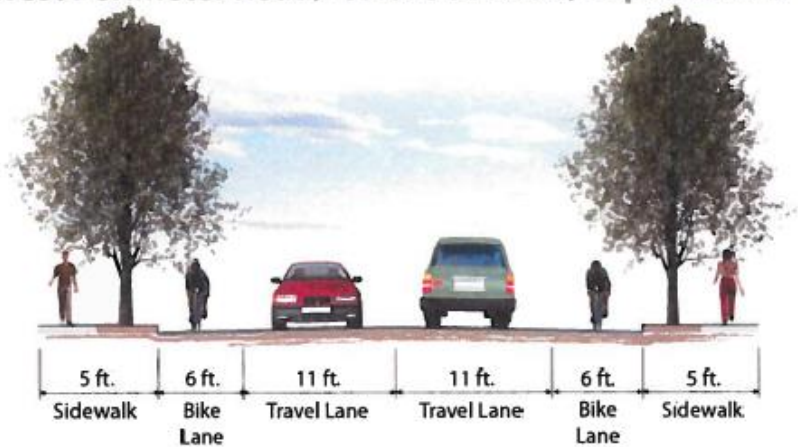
KCDD typical cross section of 2-Lane Street (ROW 44')
